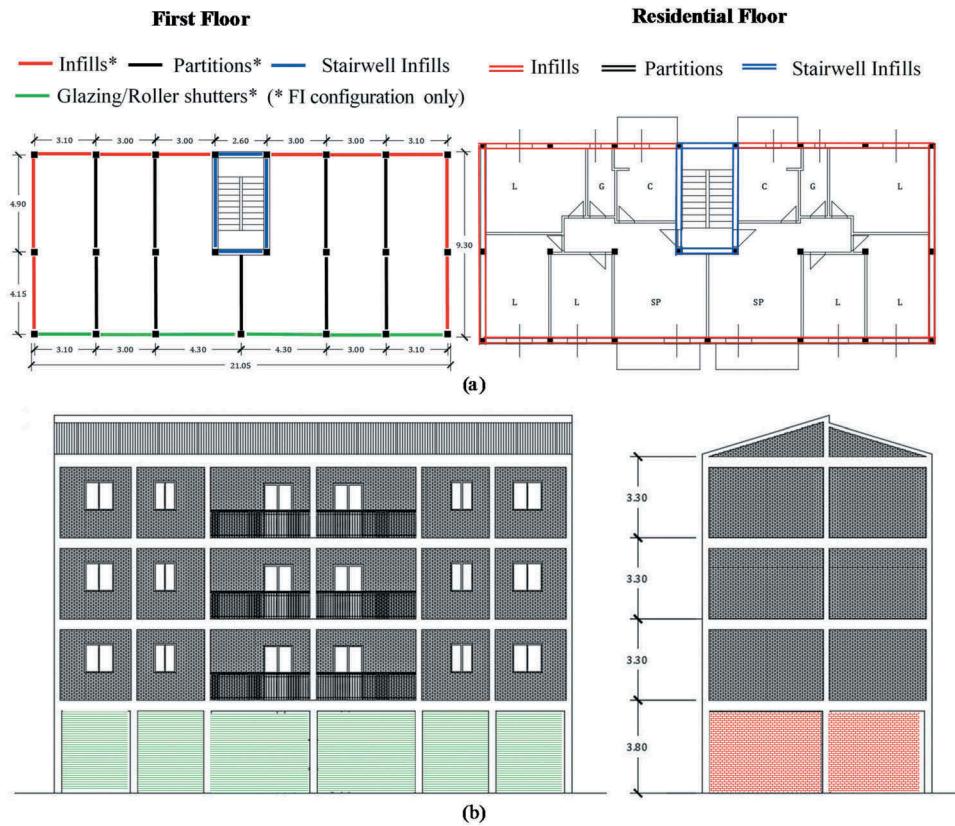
(a) Plan and (b) frontal elevations of the case study buildings, considering two different non-structural layout configurations (Pilotis and fully infilled).
